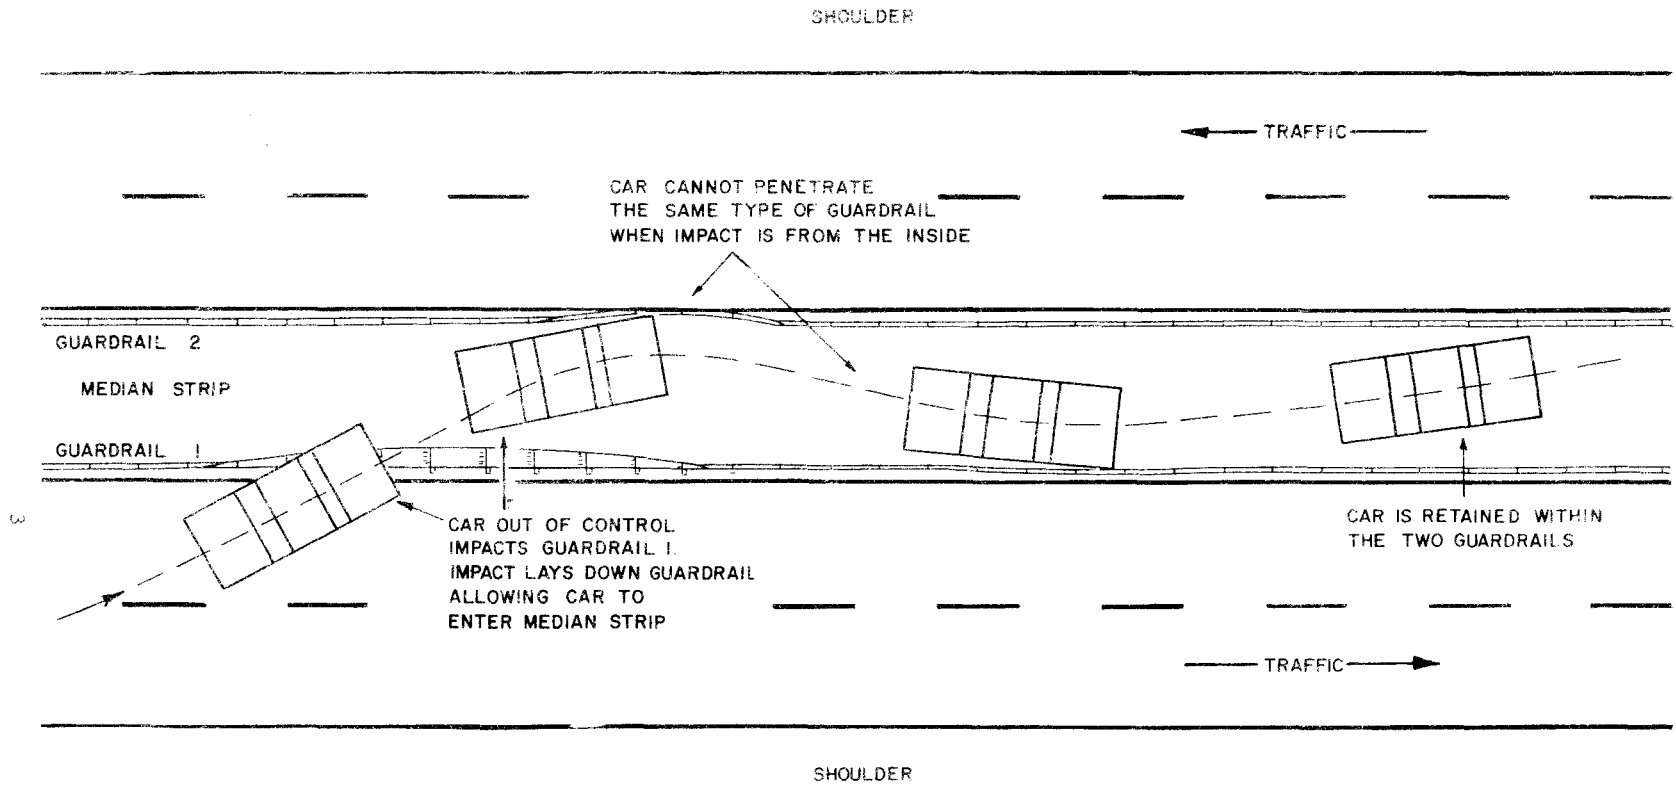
, IDEALIZED FUNCTION OF ONE-WAY GUARDRAIL INSTALLATION
